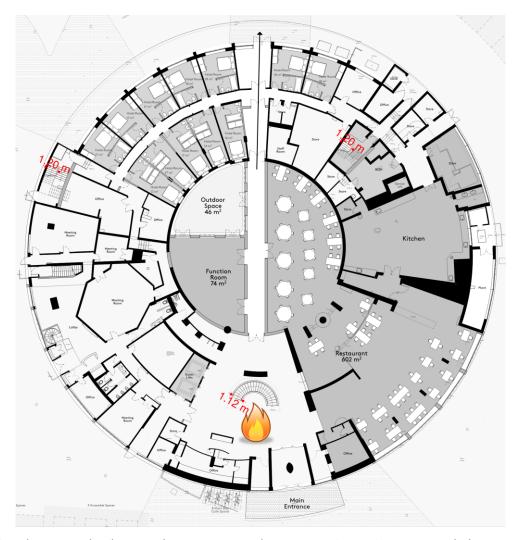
First scenario, fire blocking the open stair at ground floor of the hotel building
